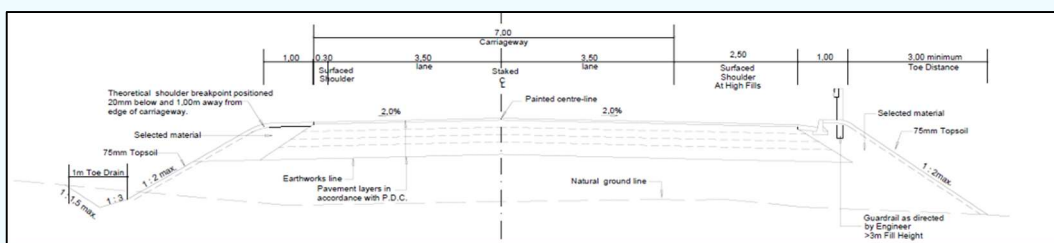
Typical Cross-Section Design for the DR3342 Road Upgrade.
